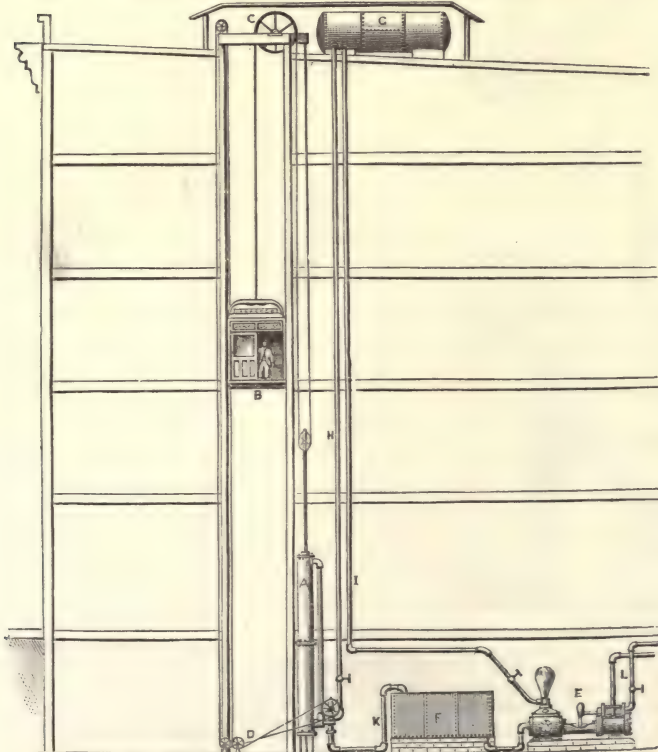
Hydraulic elevator—gravity- and roof-pressure.
